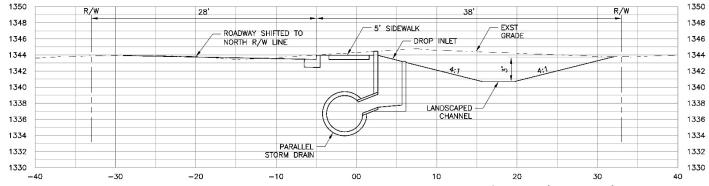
Cheney Channel Typical Section with Storm Drain Overflow Inlet (Facing East)
